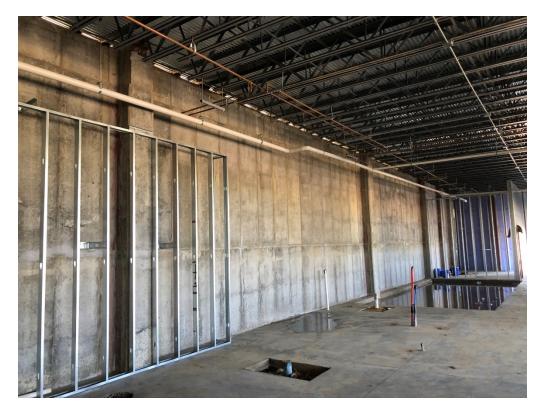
Will You cut Through Concrete Foundation for Venting?
